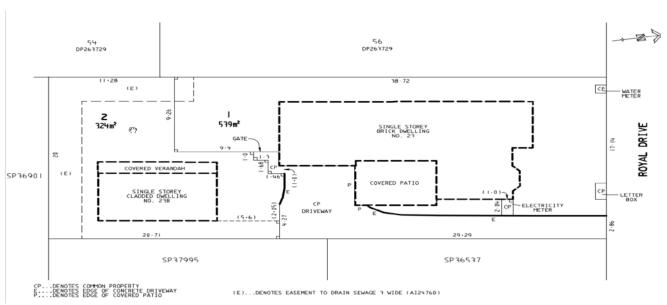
Proposed Plan of Subdivision – 23 Royal Drive POTTSVILLE
